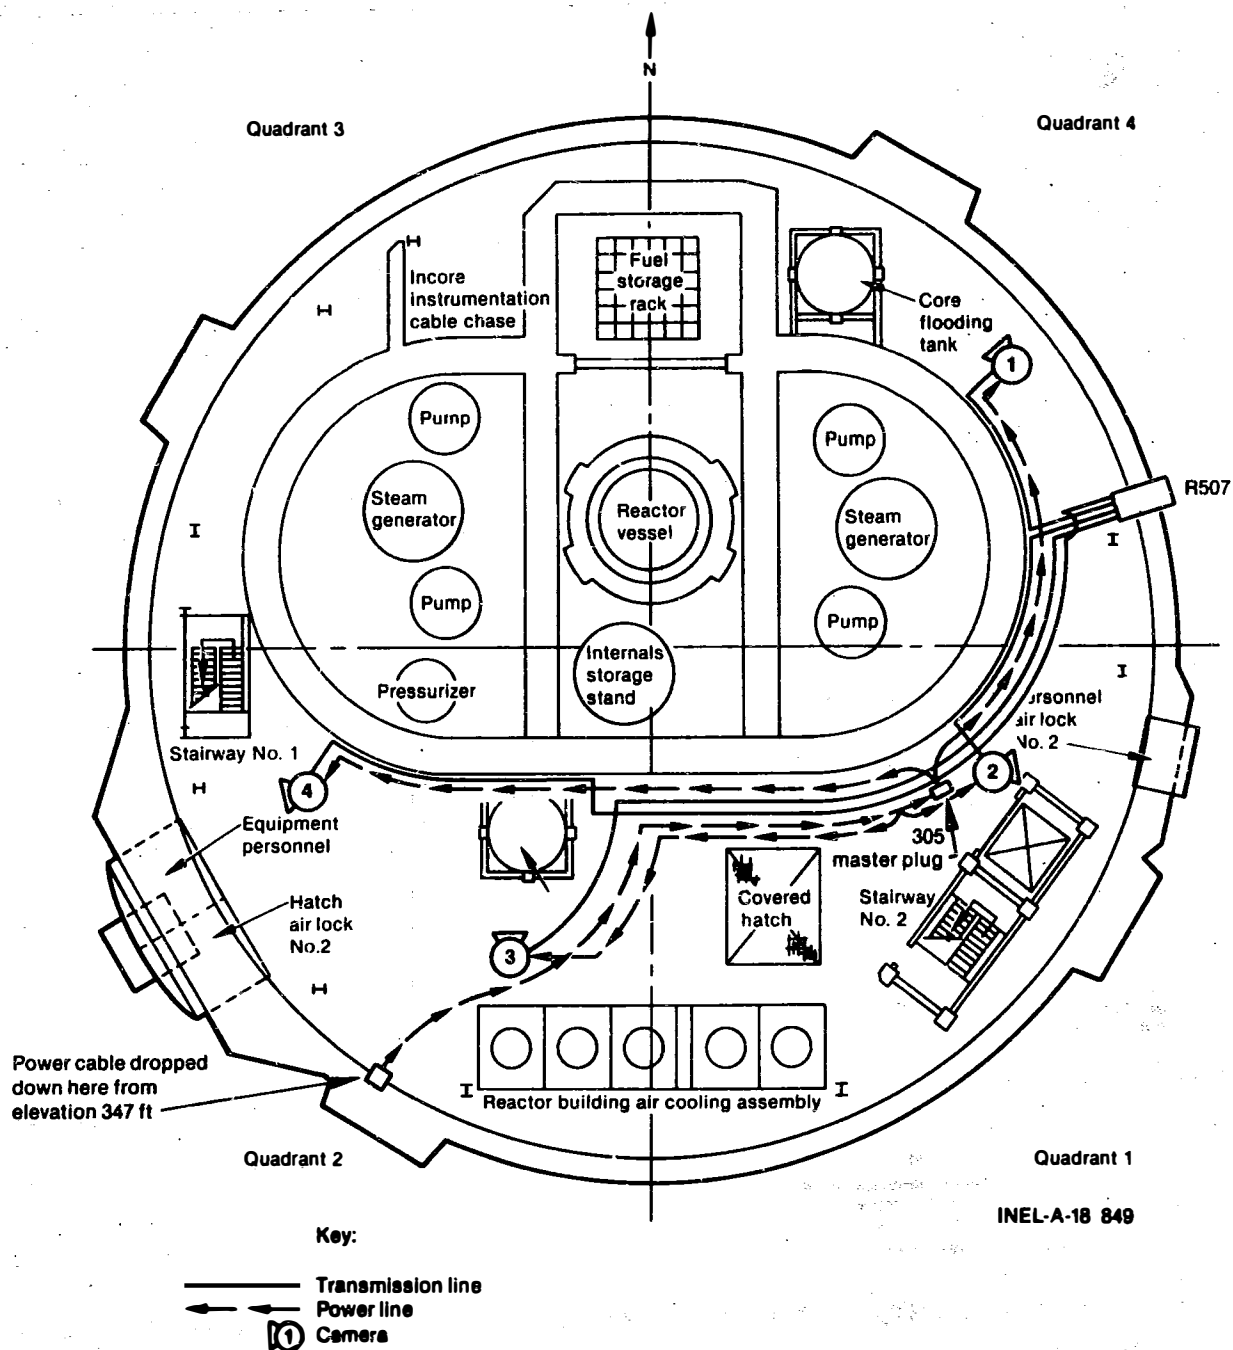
Entry 6, Elevation 305 camera cable routing diagram.
